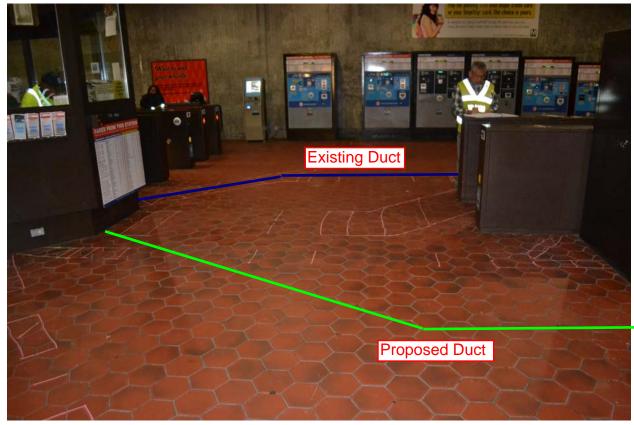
Existing and proposed duct run from Kiosk (Angle 2).
